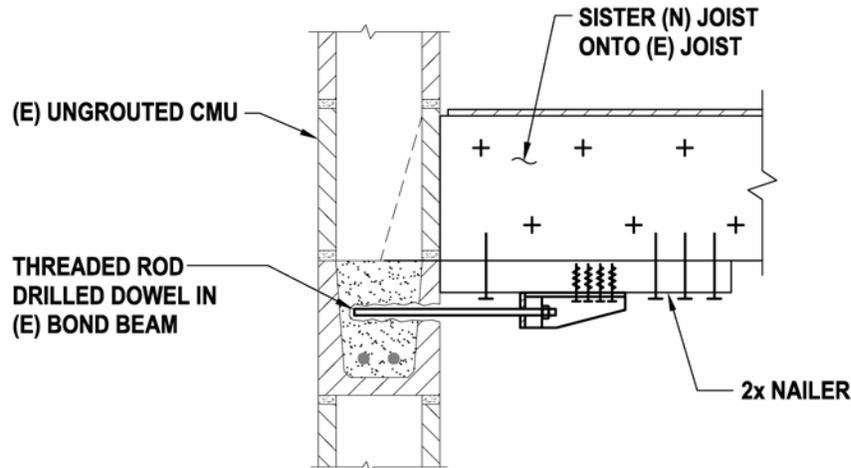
Wall-to-Floor Tension Tie in Hollow Masonry Alternate
